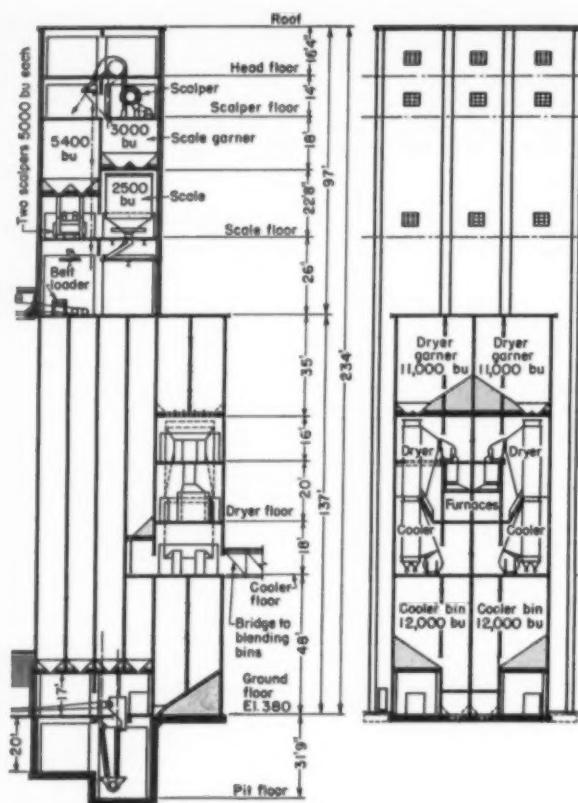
Cross-sections through combined workhouse and drier (left) and through drier alone (right) show variety of walls, beams, and openings which occur in this type of structure. Floors and bin bottoms (which hang from bin walls) are built later.
